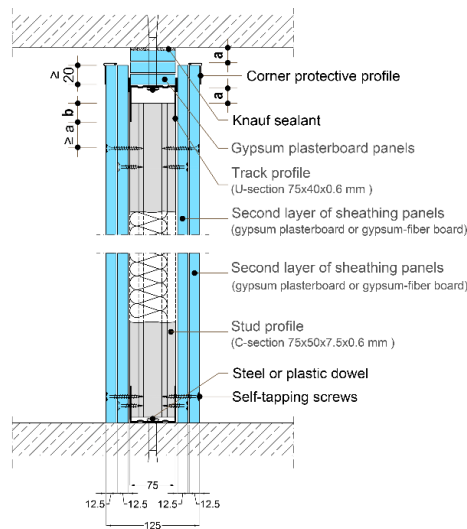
Vertical section of the examined lightweight steel drywall partition walls
